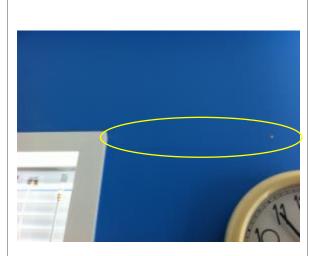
Vertical Hairline Crack at Wall Lining Joint above Door in the Communications Room
